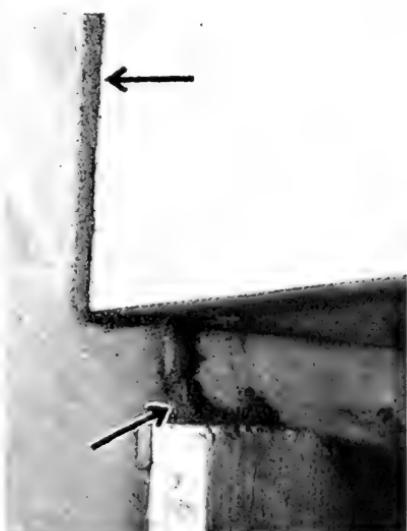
Termite tube extending from a wooden door frame up over the outside of a concrete beam to the wood timbers of a house. The figure does not show the wood above the concrete beam to which the termite tube leads.
